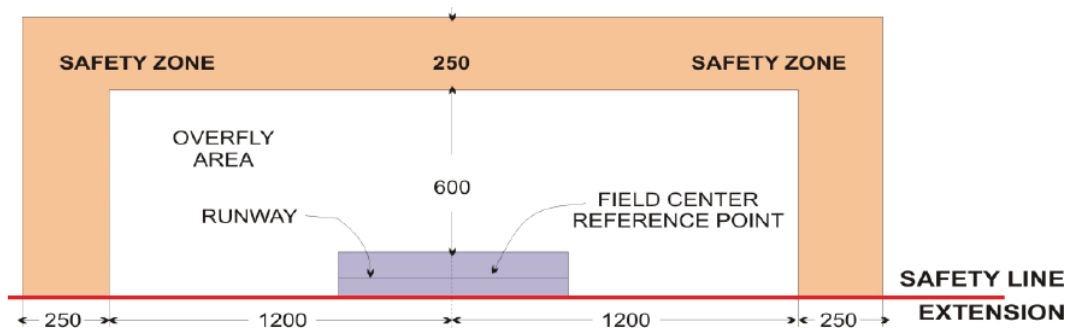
Sample layout site plan for RC model aircraft (Source: Academy of Model Aeronautics Publication 706. Fair use.).
